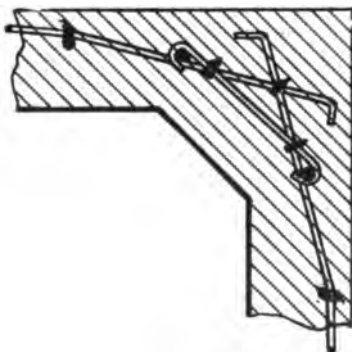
METHOD OF HOOKING CORNER REINFORCEMENT.
